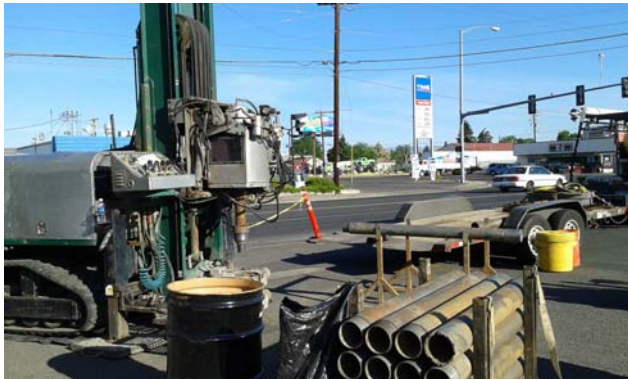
Location of Boring B-1 (Looking Northwest)
